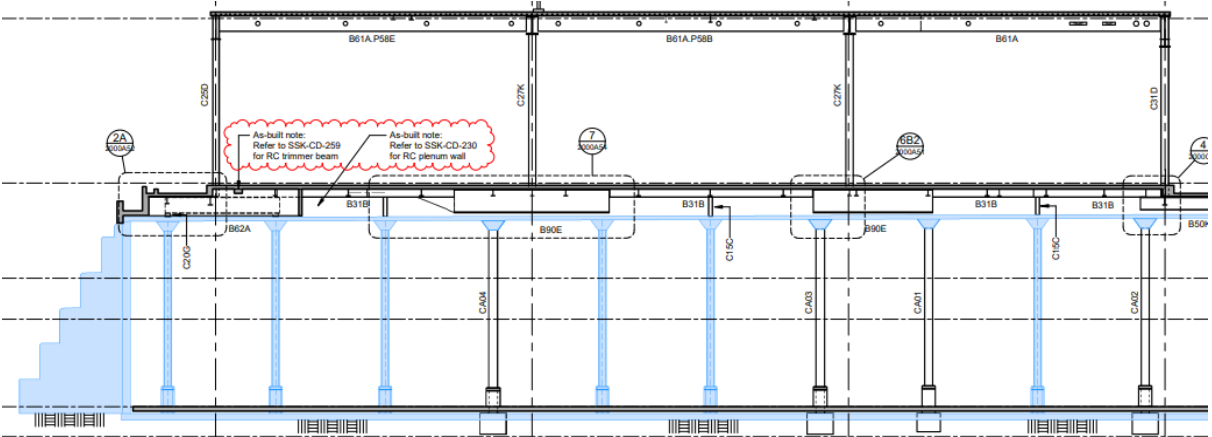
Section through tank - Existing structure blue, new columns white, transfer floor and new gallery structure over.
